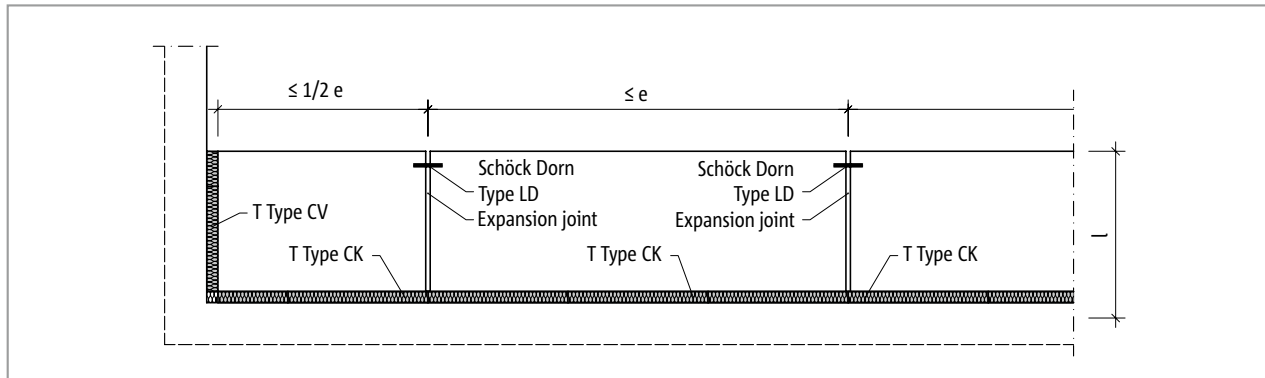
Schöck Isokorb® Type CK: Maximum expansion joint spacing
